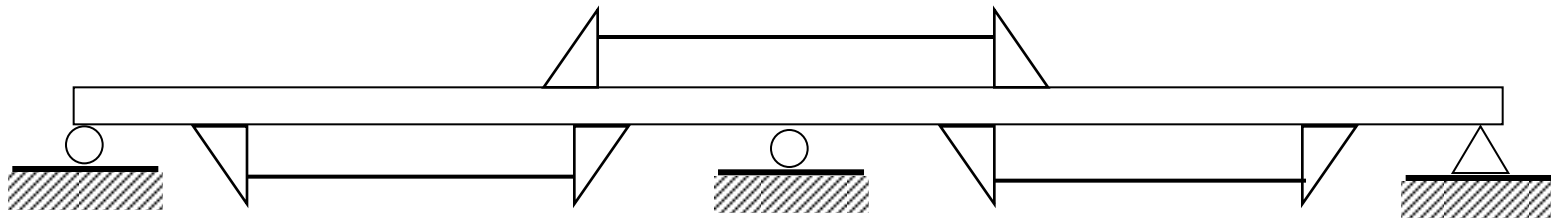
Example of a Pre-stressed Continuous Bridge Girder.
